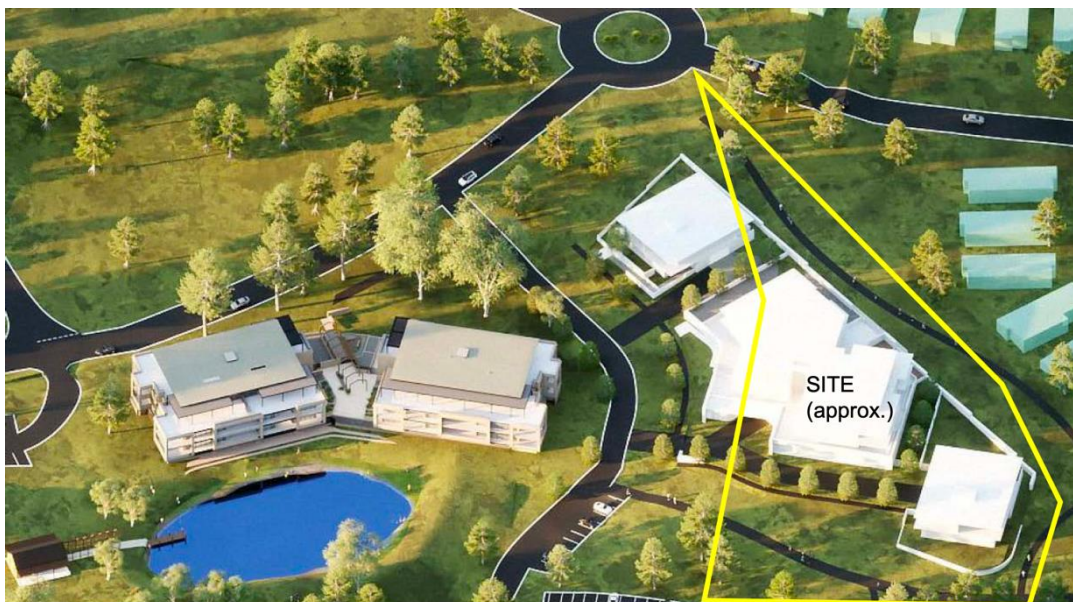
Artist's impression of the site showing existing residential flat building development (left) and concept for potential development within proposed expanded APU area (right). Prepared by EJE Architects
